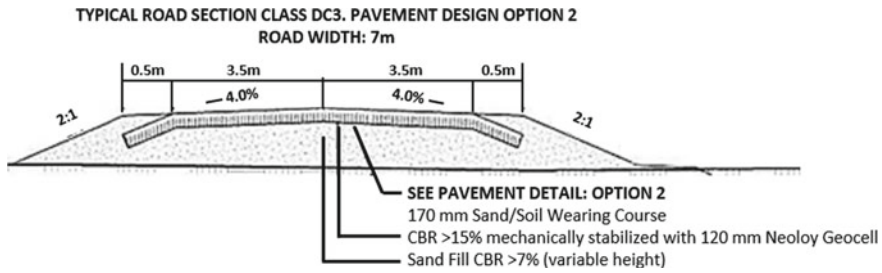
Typical road section drawing with Neoloy Geocell base reinforcement. *Source* WSP
